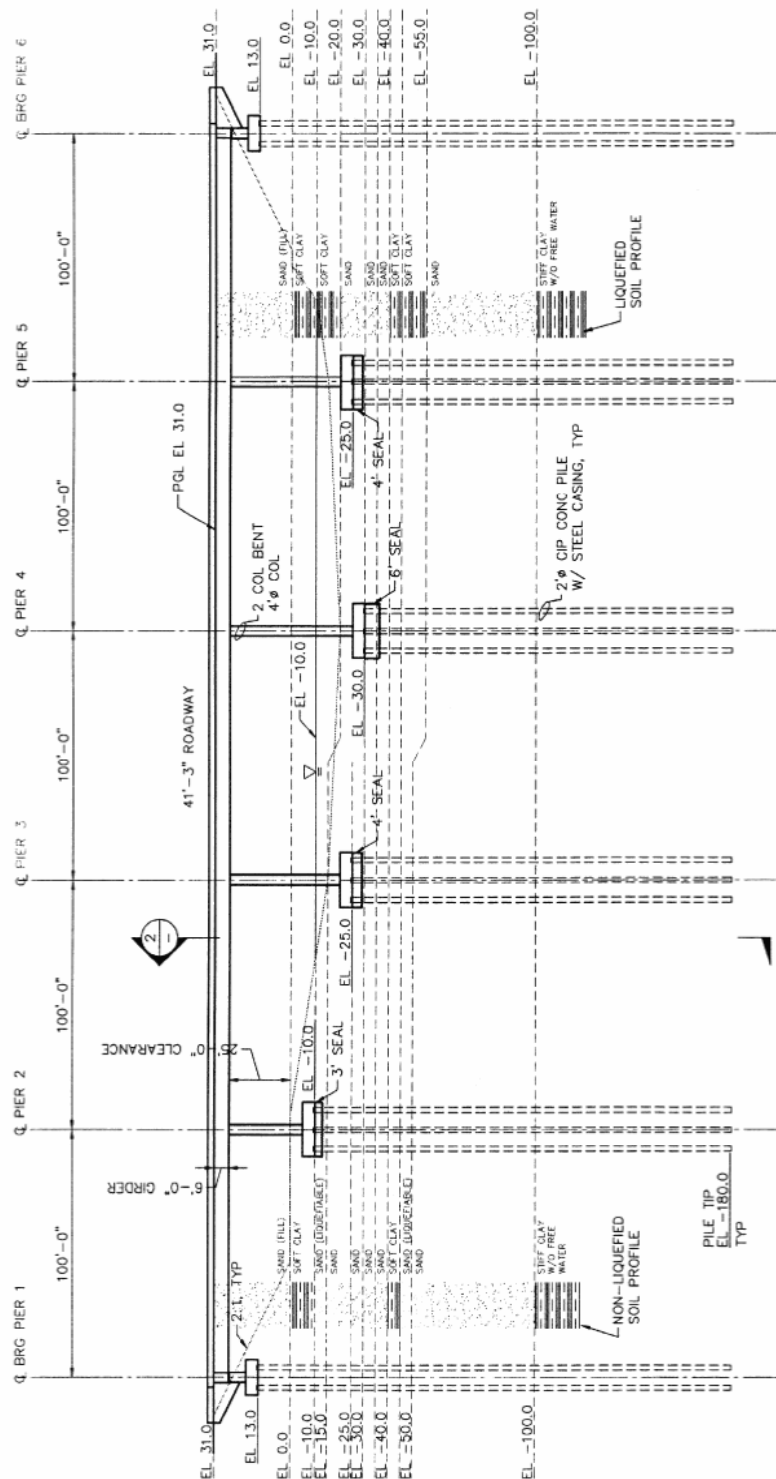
Washington Bridge Configuration (NCHRP, 2003)
